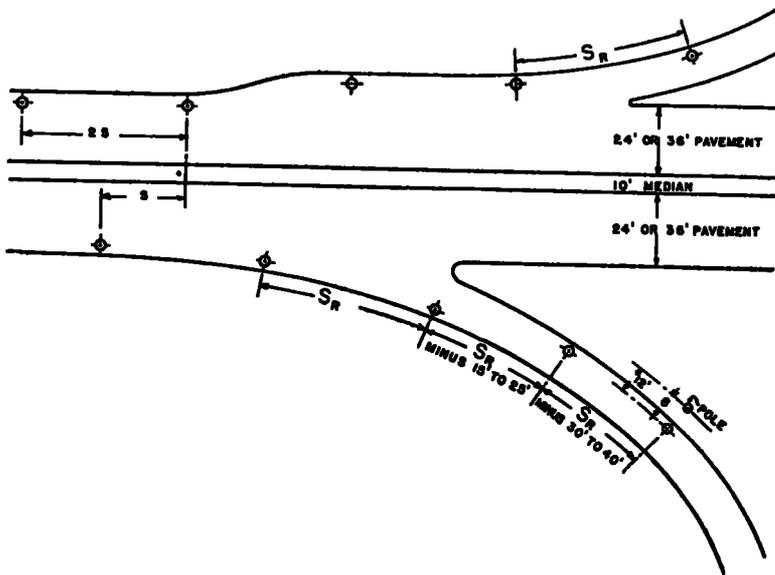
Plan of Ramps with Typical Lighting Layouts Leaving and Entering the Freeway and on Curves.
